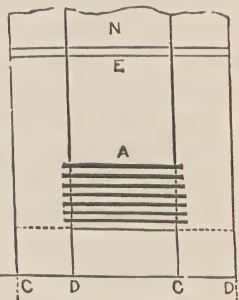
FRONT ELEVATION OF FIREPLACE.
